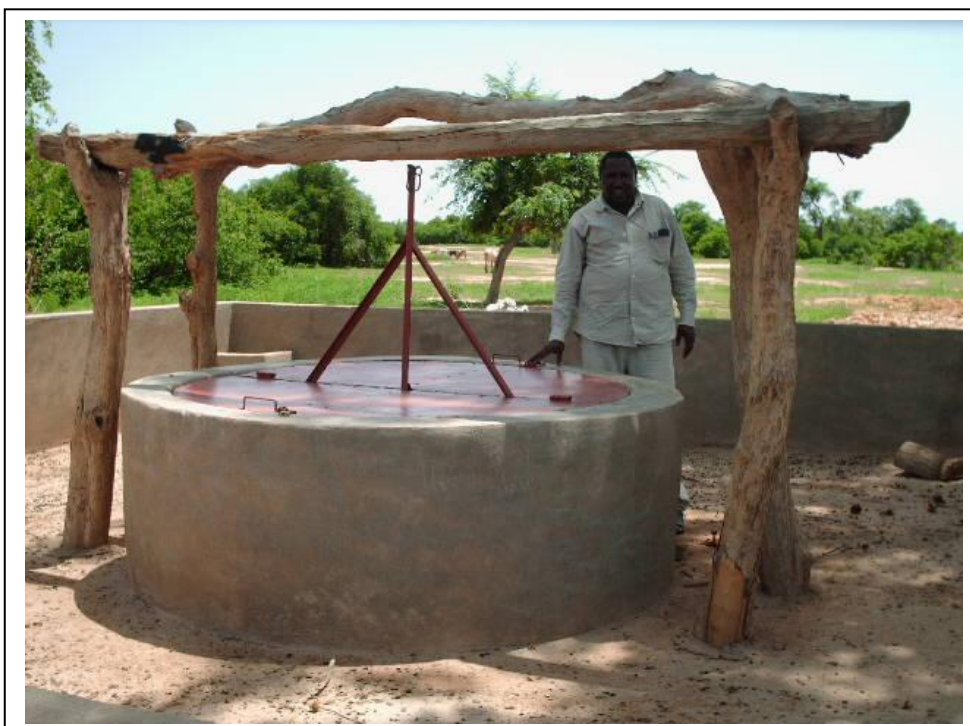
The Togouma pastoral well showing details of metal covering and the wall and concrete apron protecting the well surface from damage
